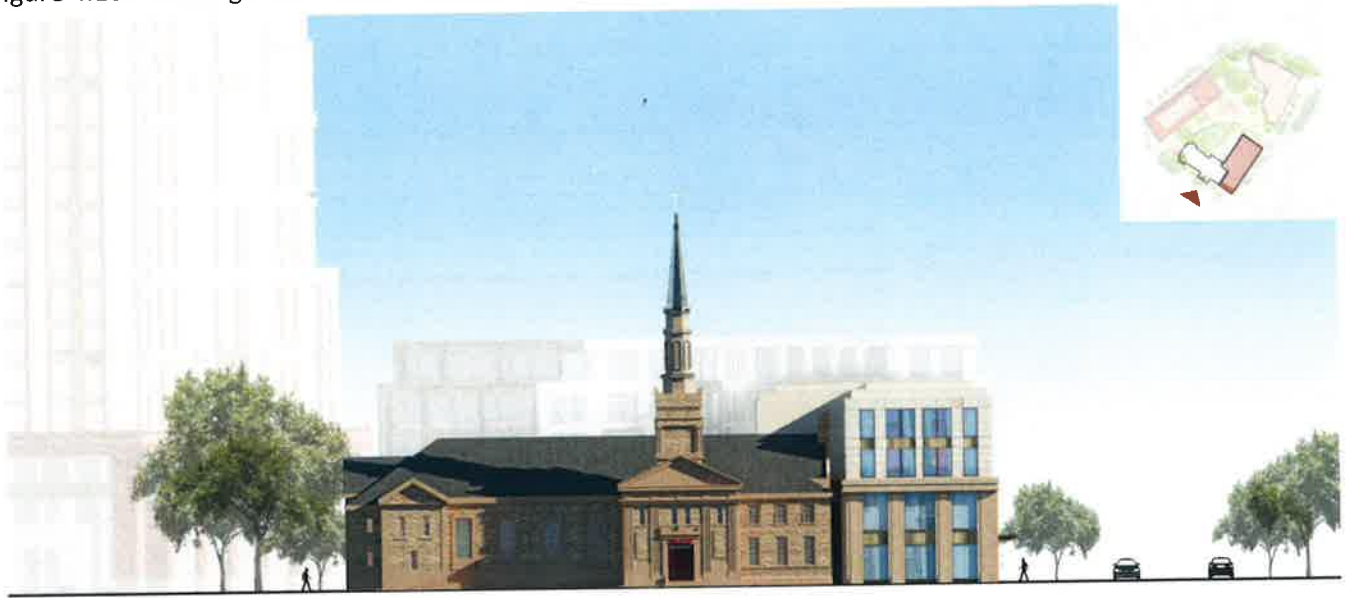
Building 3 Southwest Elevation | Ruggles Street
